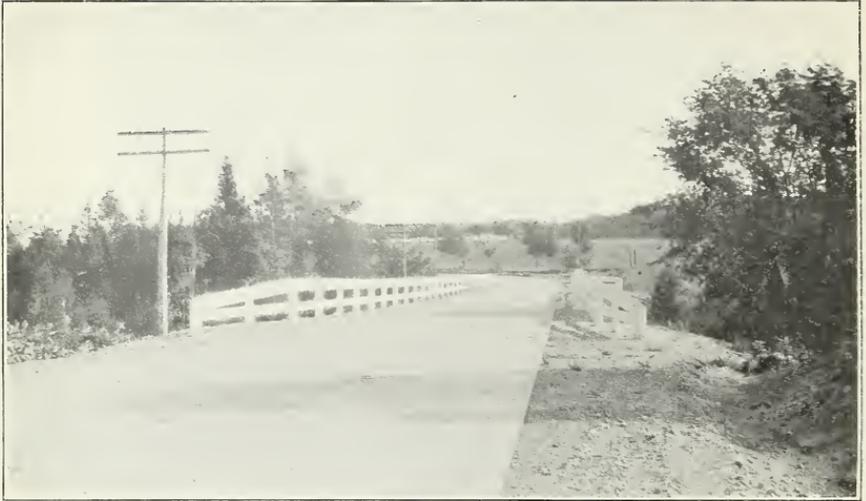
A FINISHED CONCRETE PAVEMENT.
